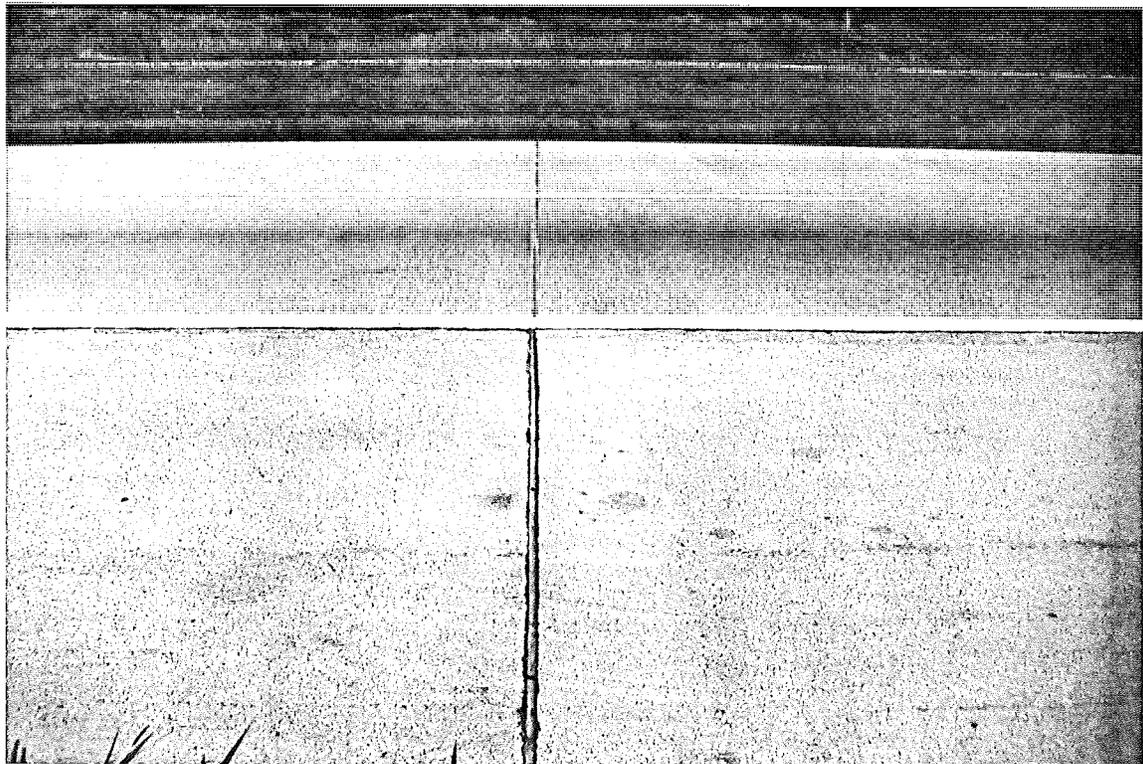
An expansion joint on CSN# 19042-24680A (Section B) EB showing some distress in the joint sealant. Sealant damage was present in several locations in the test section.
